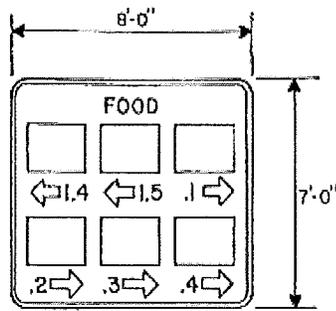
TYPICAL EXIT RAMP BACKGROUND SIGN PANEL DETAIL
